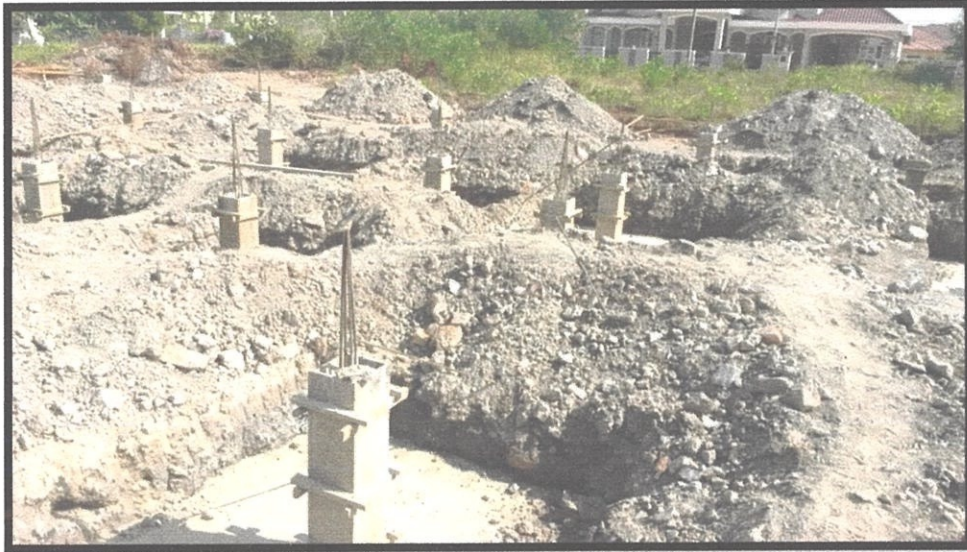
The grade of concrete that use for the foundation is grade 25
